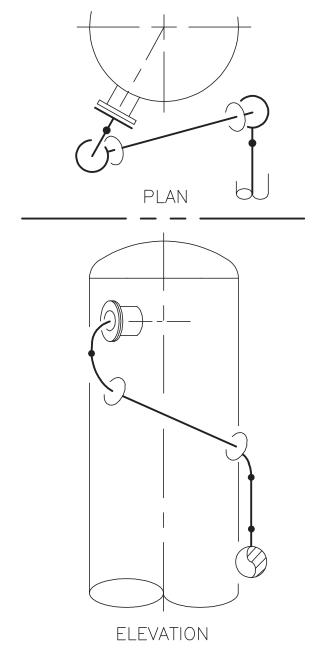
Plan and Elevation views of a rolling offset.
